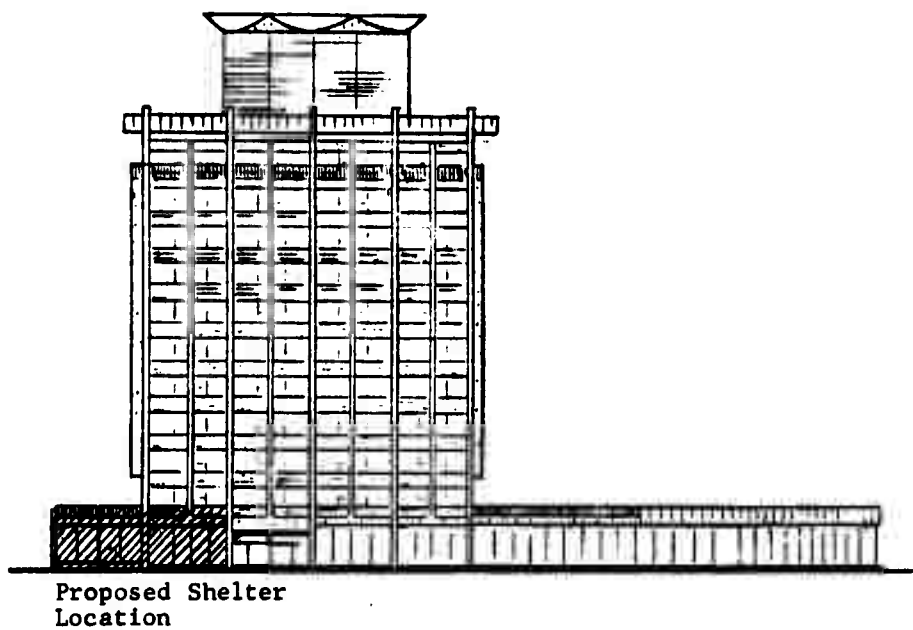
ELEVATION OF PLAZA ONE BUILDING
